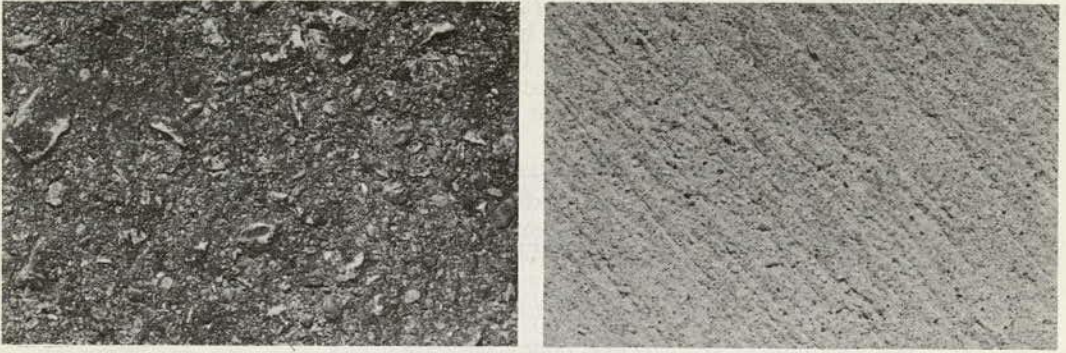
Typical example of surface texture of (left) asphaltic concrete and (right) portland cement concrete at start of test traffic.
